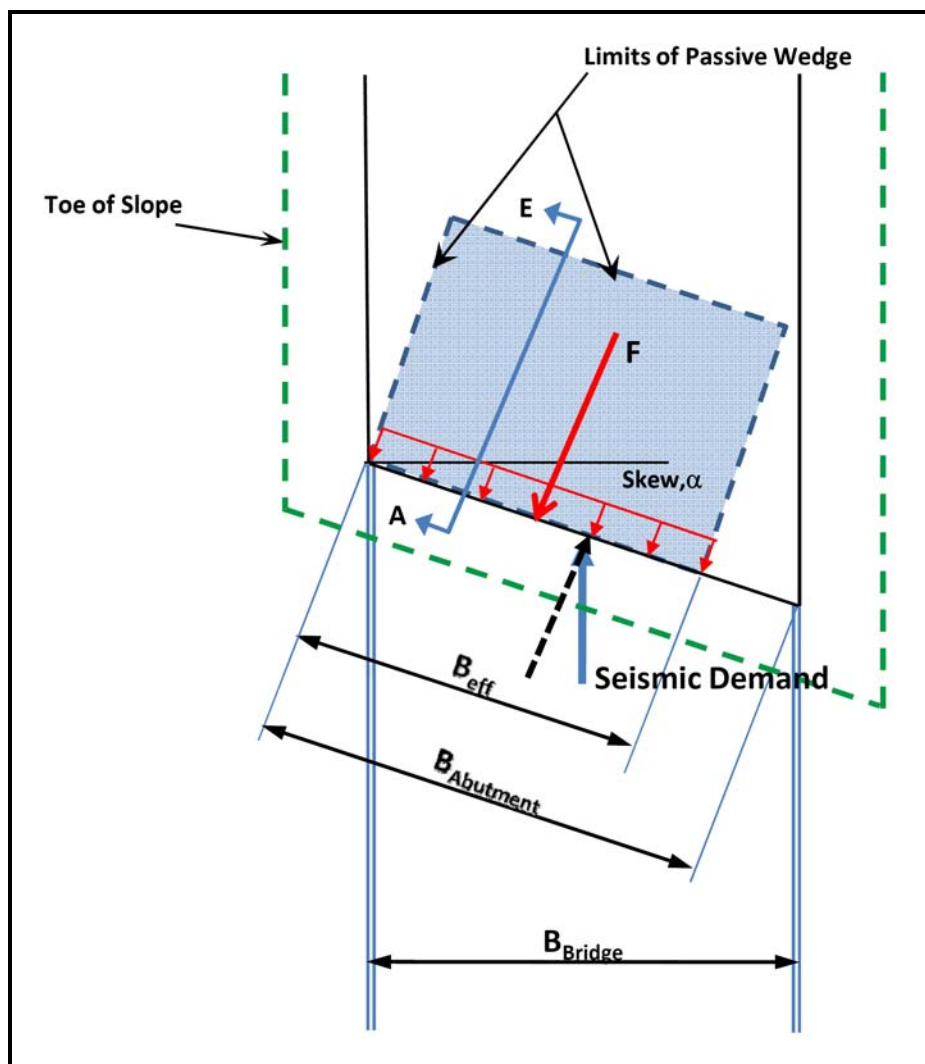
, Skewed Bridge Abutment Backwall Seismic Passive Resistance
